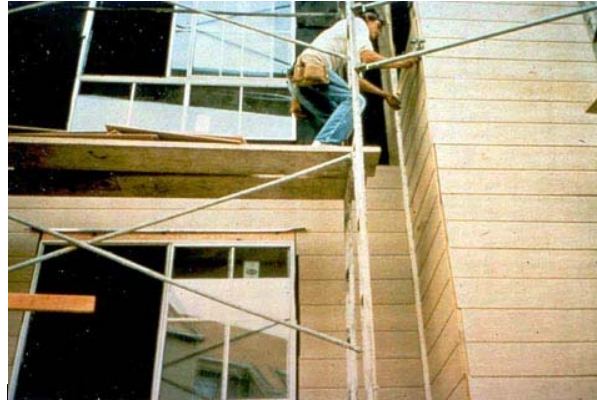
Example of a scaffold that is not fully planked. Also planks are not cleated or otherwise secured against displacement. There is also more than a 14-inch gap between the building and the scaffold platform, no
